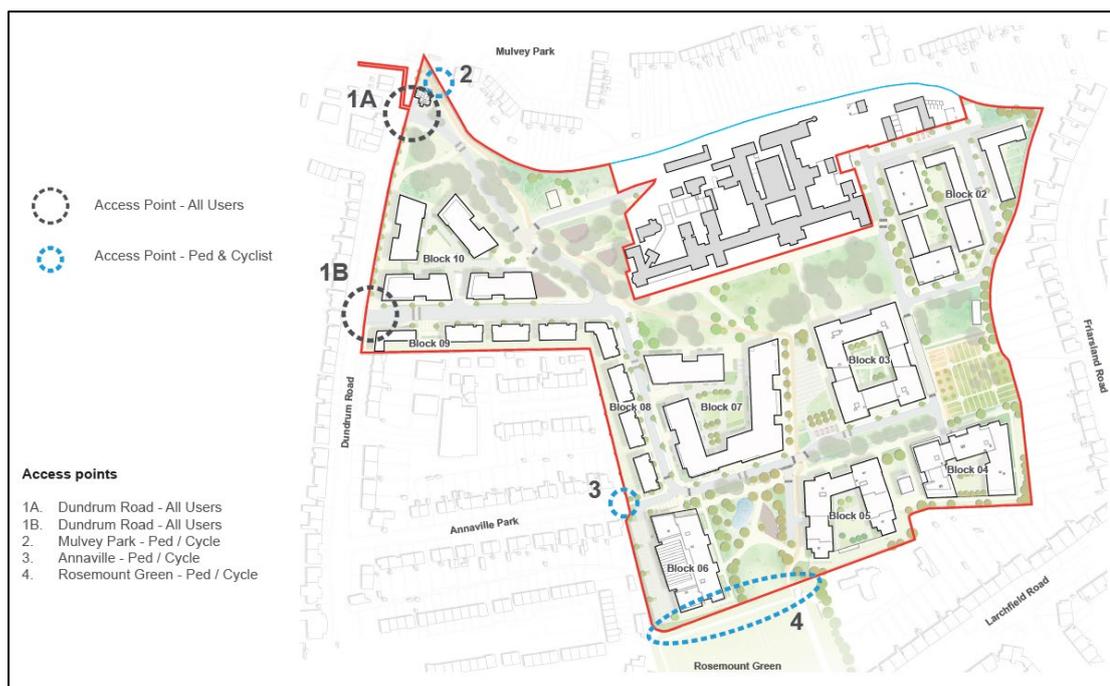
Extract from Reddy A + U Architectural Design Report showing proposed access points and breaks in the perimeter wall.
